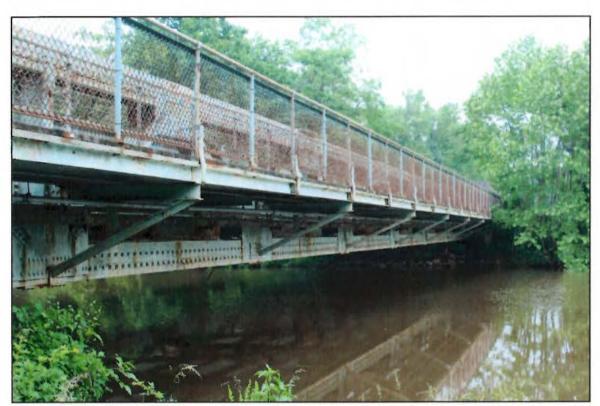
Present day photo (2018) of Facility No. 1590 looking northeast.
